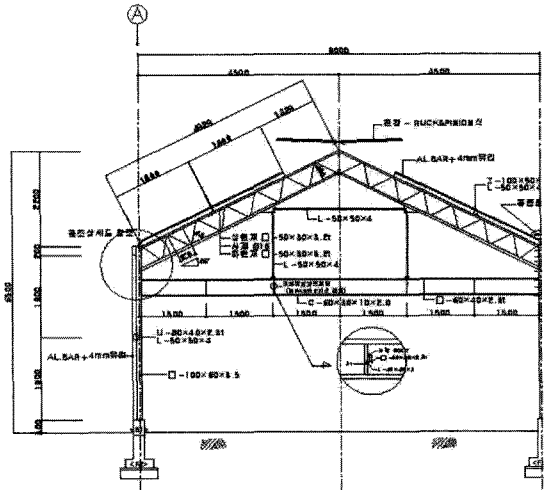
Wide span-type greenhouse (9 m × 4 m).
